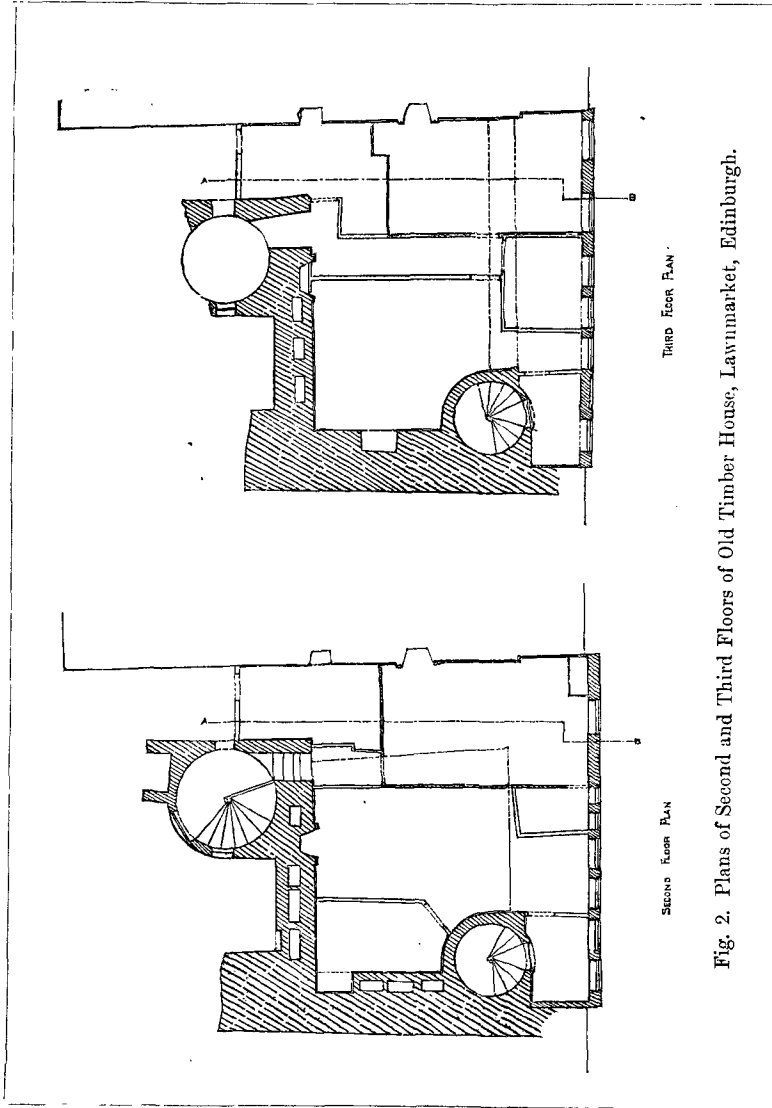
Plans of Second and Third Floors of Old Timber House, Lawnmarket, Edinburgh.
